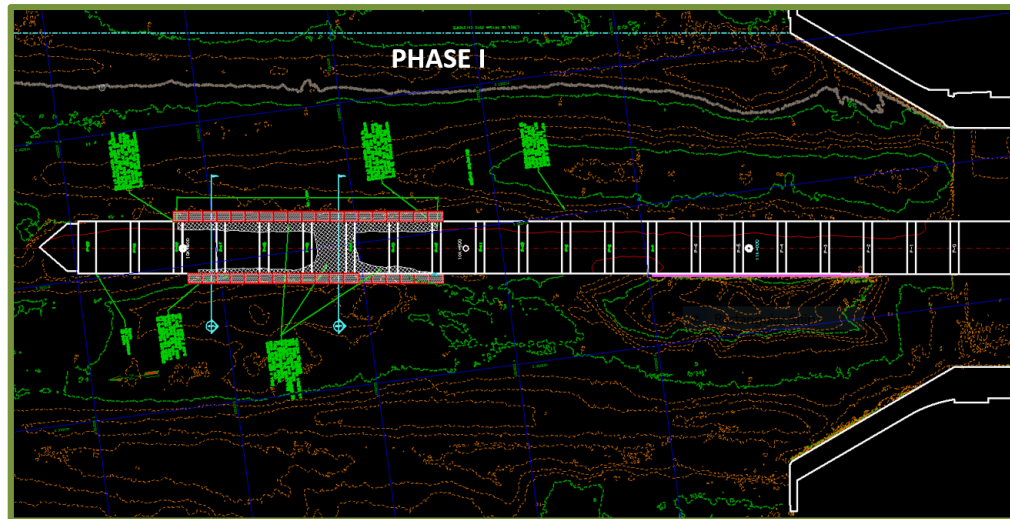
Phase 1 Repair to the Gatun Locks Dividing Wall
